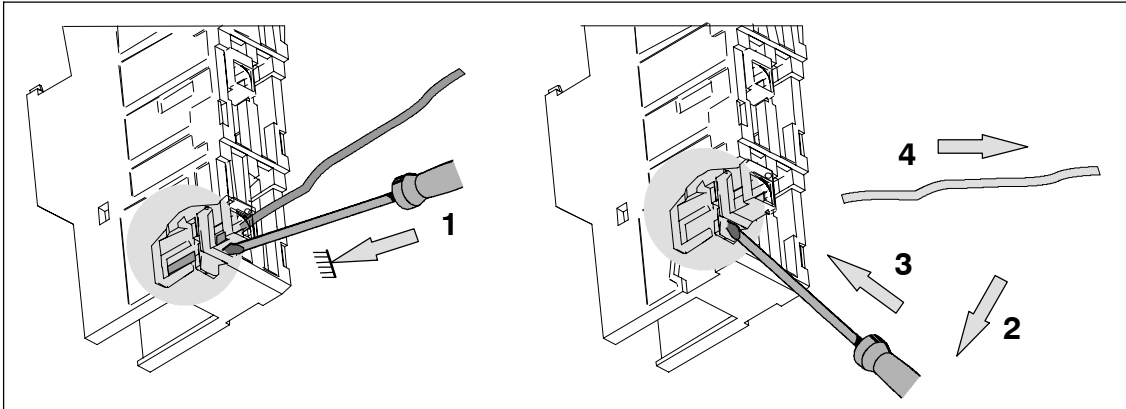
Releasing the wiring of the terminal module with Fast Connect
